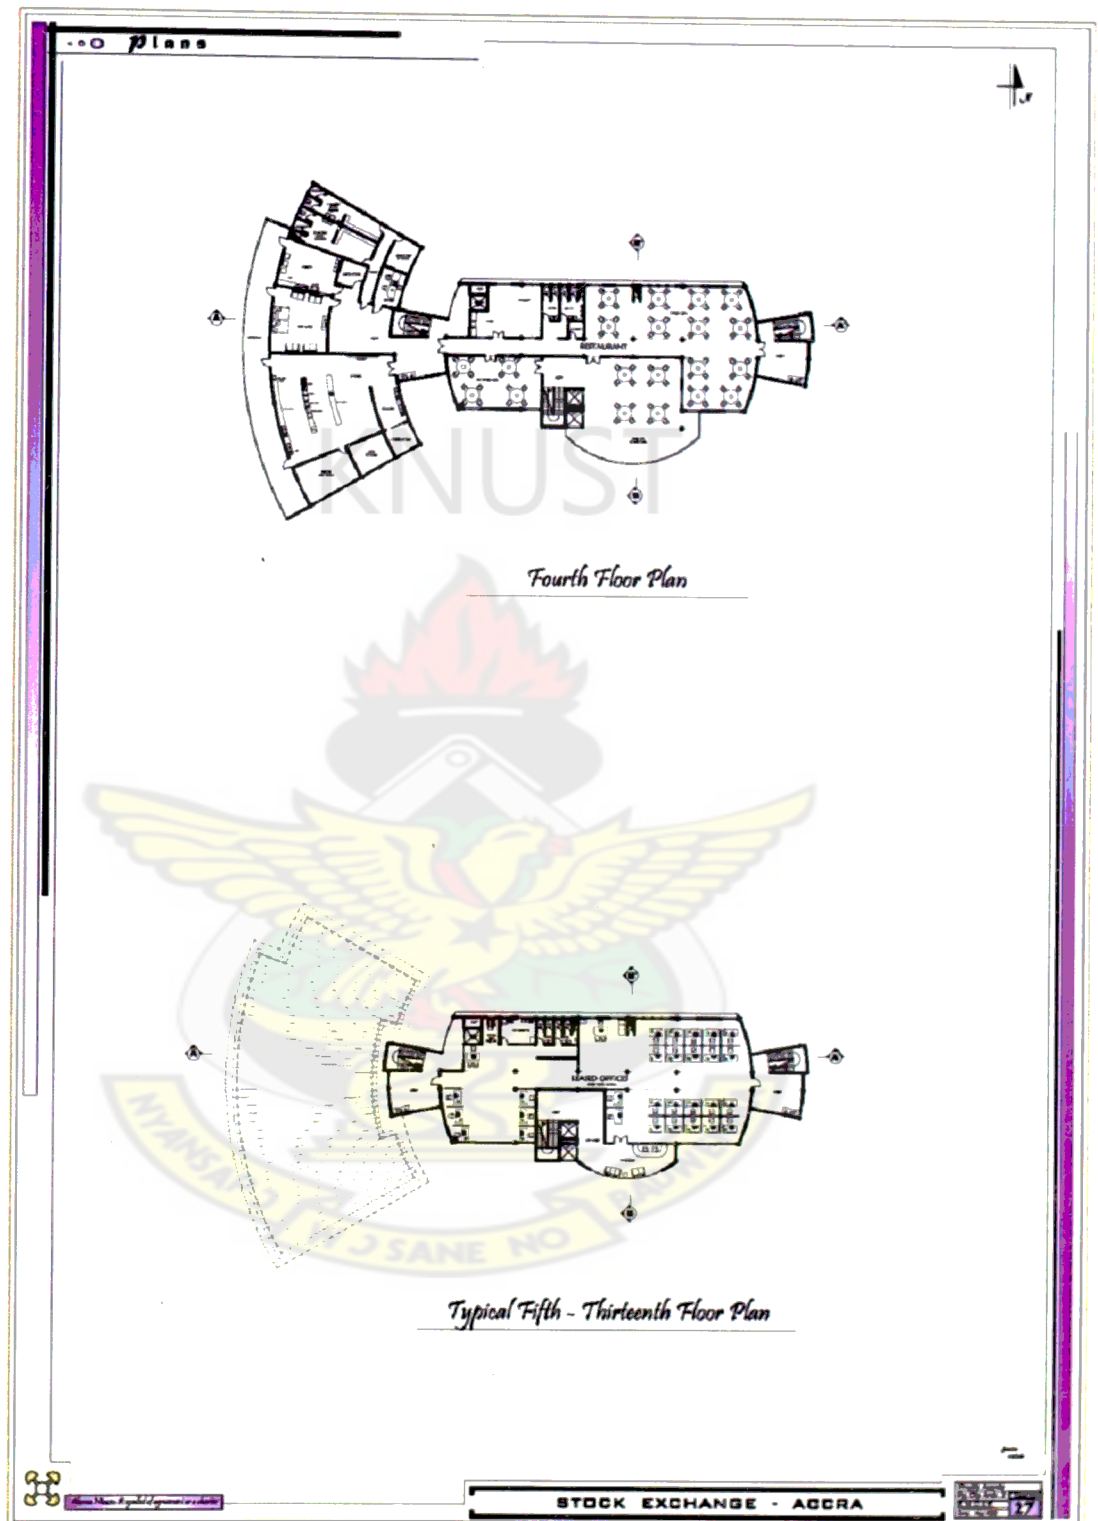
Forth floor plan and Fifth - thirteenth floor plan
